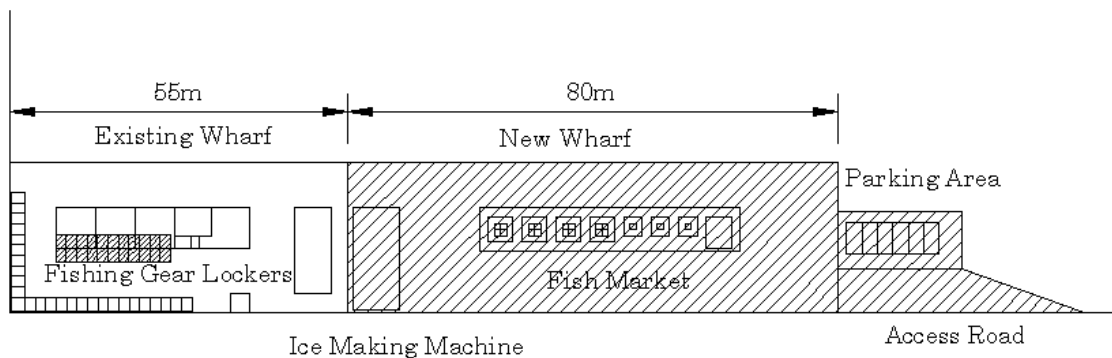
Fishing Port Facilities Basic Plan
